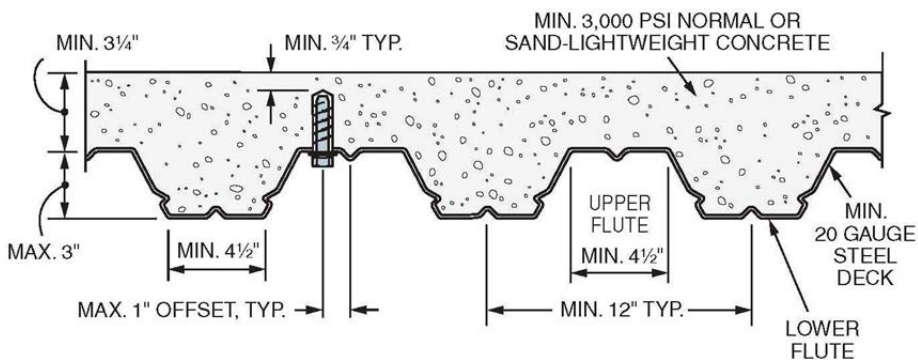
INSTALLATION IN THE SOFFIT OF CONCRETE OVER PROFILE STEEL DECK FLOOR AND ROOF ASSEMBLIES (UPPER FLUTE)
